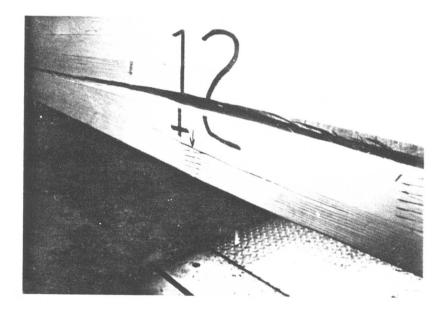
Flexural-Finger Joint Failure in the Tension Laminate on the Failed Beam.
